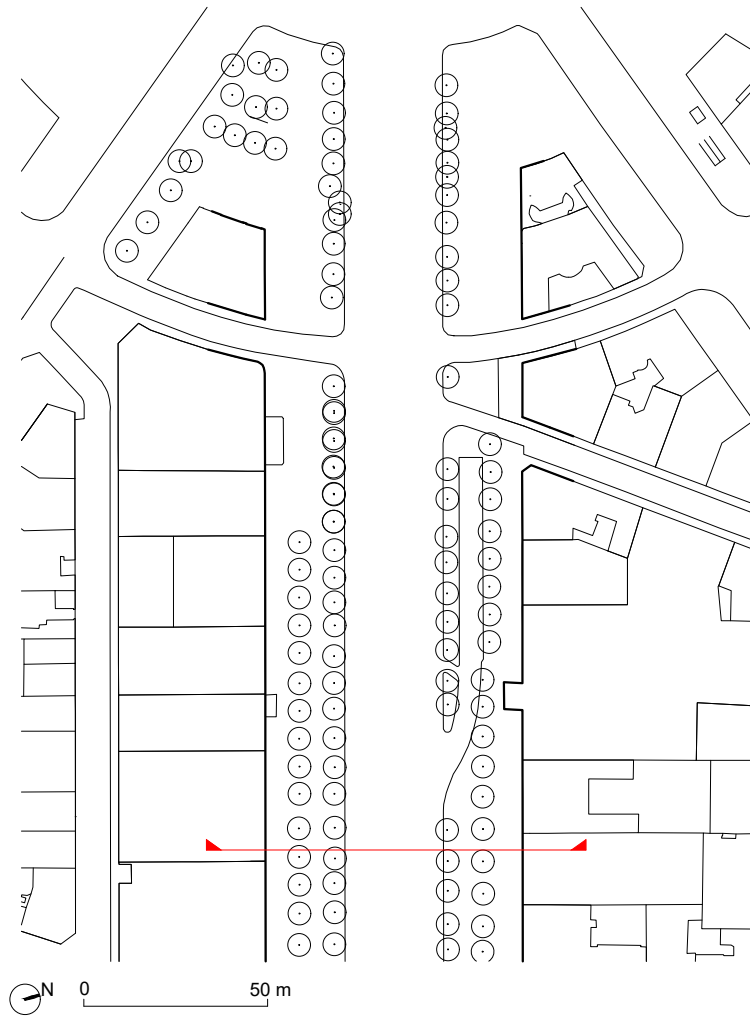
Plan and cross-section of Avenue des Champs-Élysées, Paris. (Source: Author's Edition).
